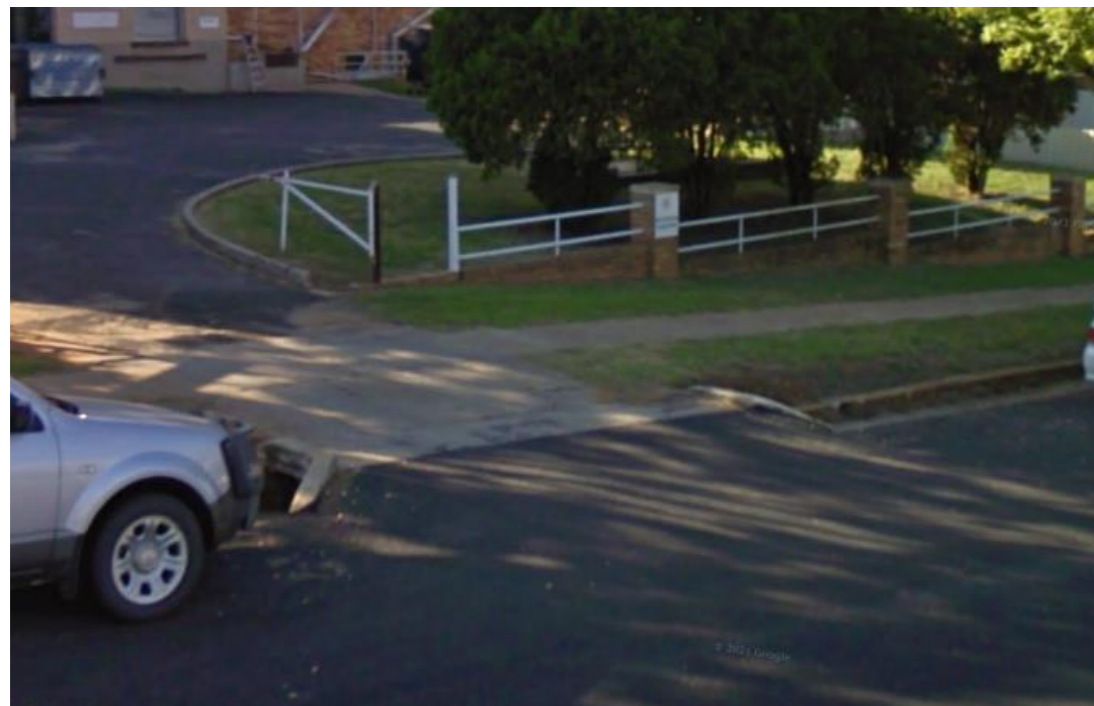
Driveway Culvert at Logistics Entry 1 on Brisbane Street. (Source: Google Maps)
